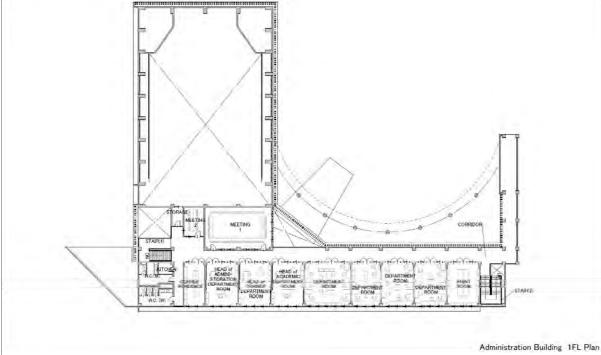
Plan of Administration Building (Elevation & Section)
